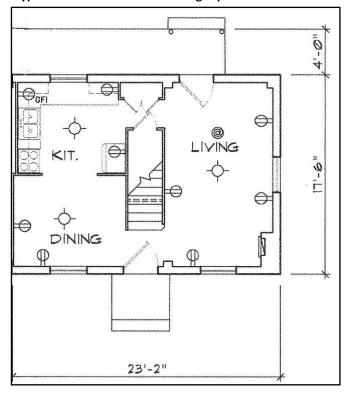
Type E, Two-Bedroom Floorplan – First Floor; Note: Type E2 has water heater and larger porch on south side
